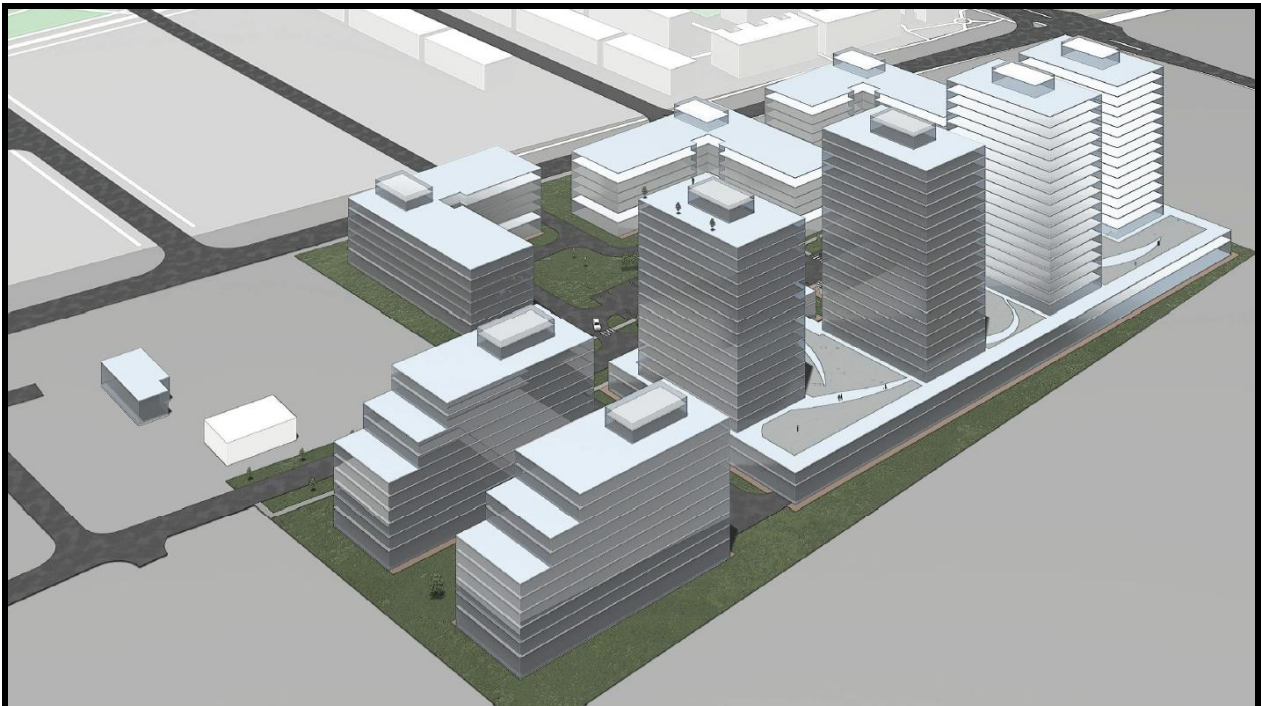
August 2020 Draft Proposal Showing Site 3D Massing of Proposed Development Design Looking North
